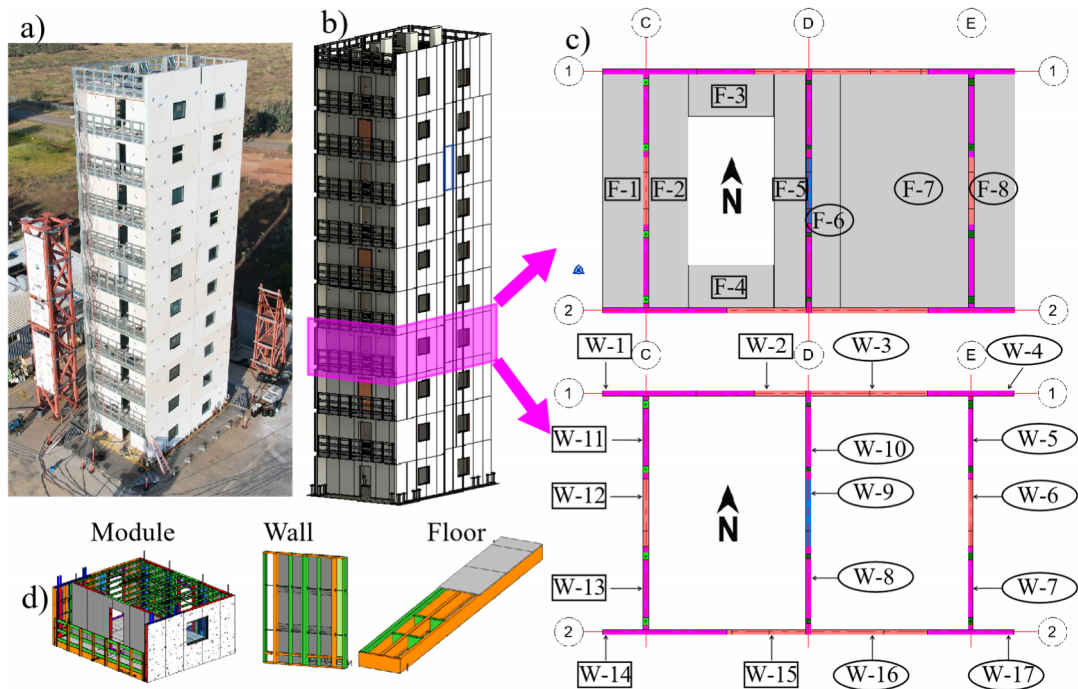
CFS10 assembly layout: (a) full-scale specimen; (b) BIM model; (c) floor plan arrangement, rectangular-panelized, oval-modular; (d) representative assemblies (ceiling assemblies not shown for clarity).
